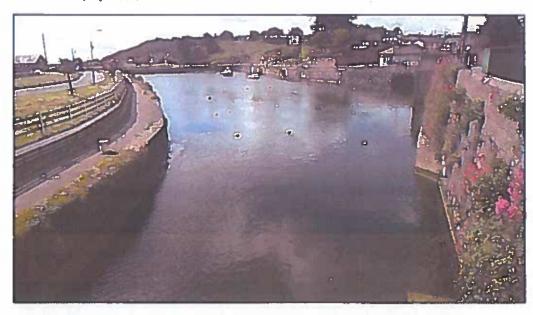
View looking south into the larger basin, highlighting the concrete lintels that run along the base of the quay walls.
